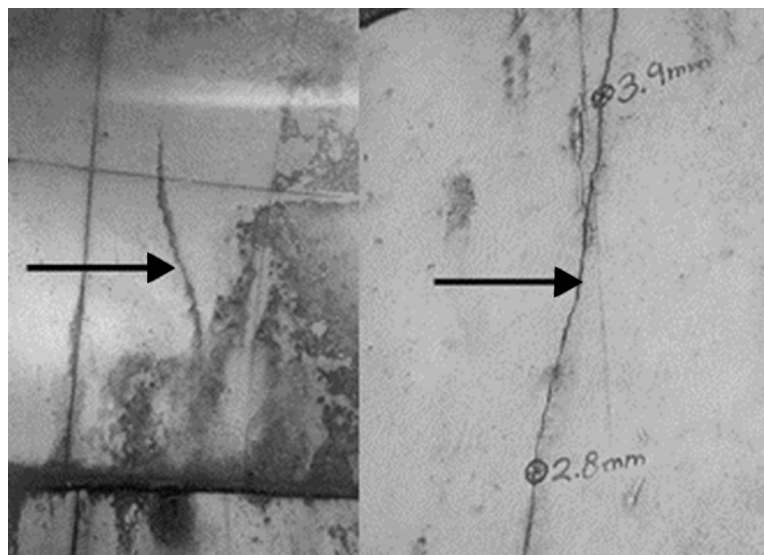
Typical structural cracks observed on the unreinforced concrete arches.
